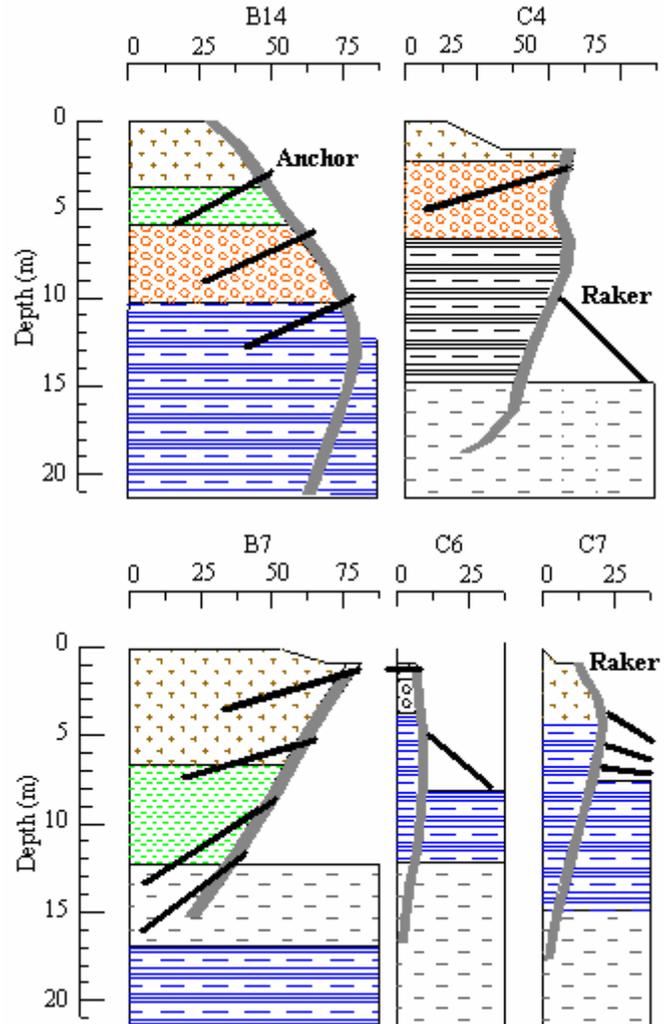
(a): Typical sections-wall deformations  $\delta H$  (mm) for floating excavations with soil anchors and inclined rakers
